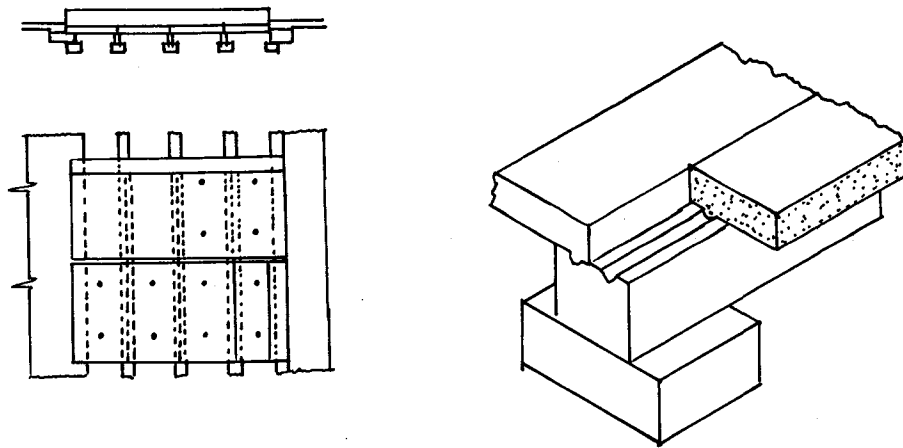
PREFABRICATED SLABS ON LONGITUDINAL FOUNDATIONS
